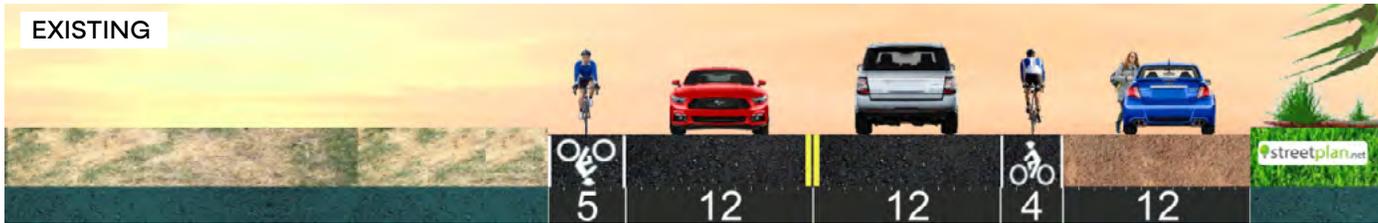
Existing Conditions: LOVR between Ravenna Avenue and Palisades Avenue
